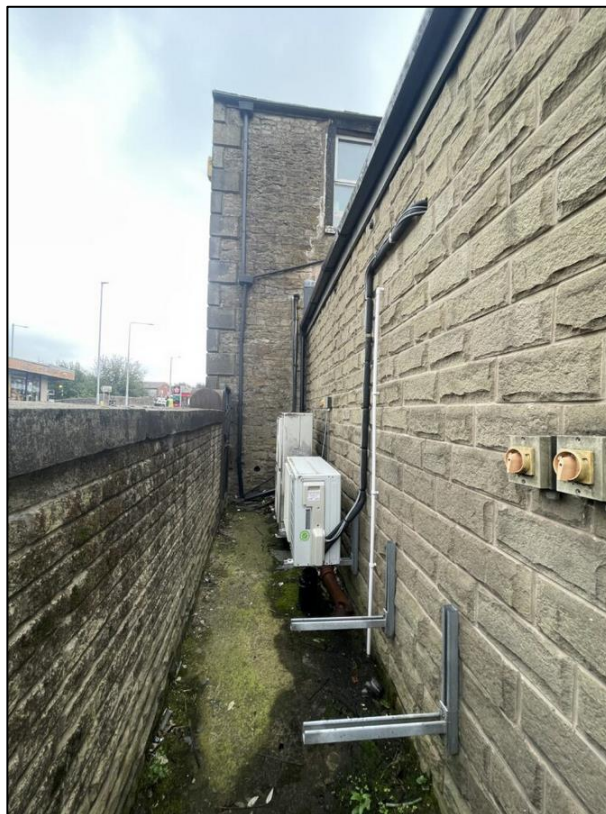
South elevation of the side-extension building, noting the air-conditioning / refrigeration units present
